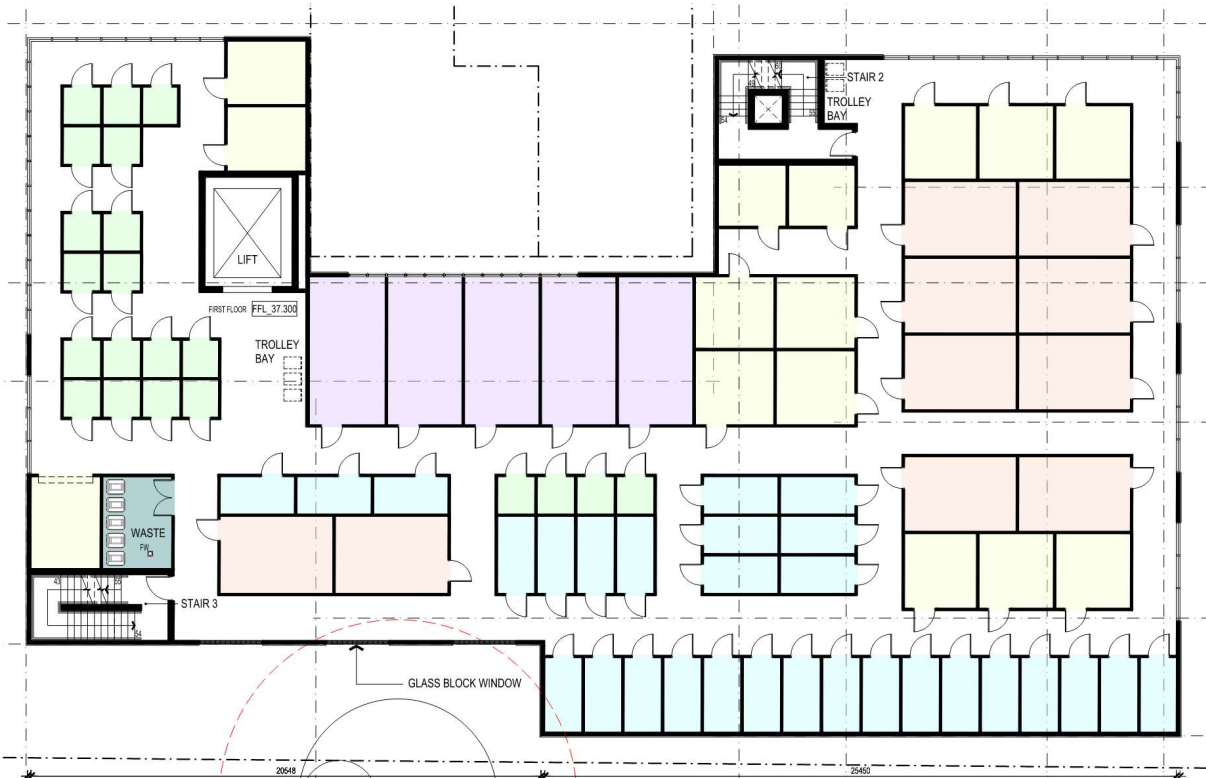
Crawford Architects Drawing A102 –First Floor Level
